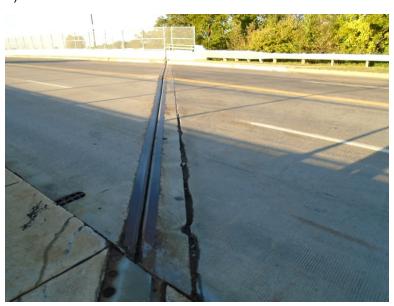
Forward Backwall, minor chips/spalls along top
